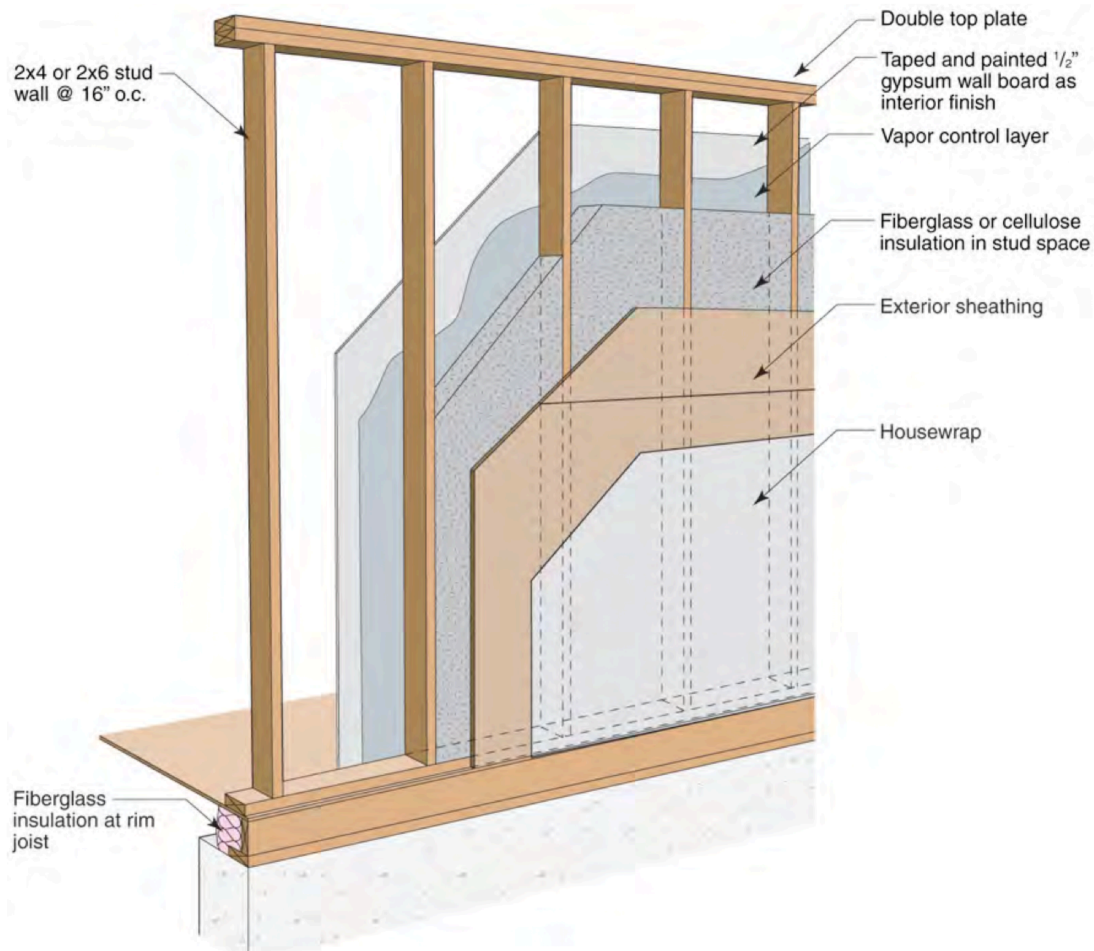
Standard wall construction (Straube and Smegal 2009).
